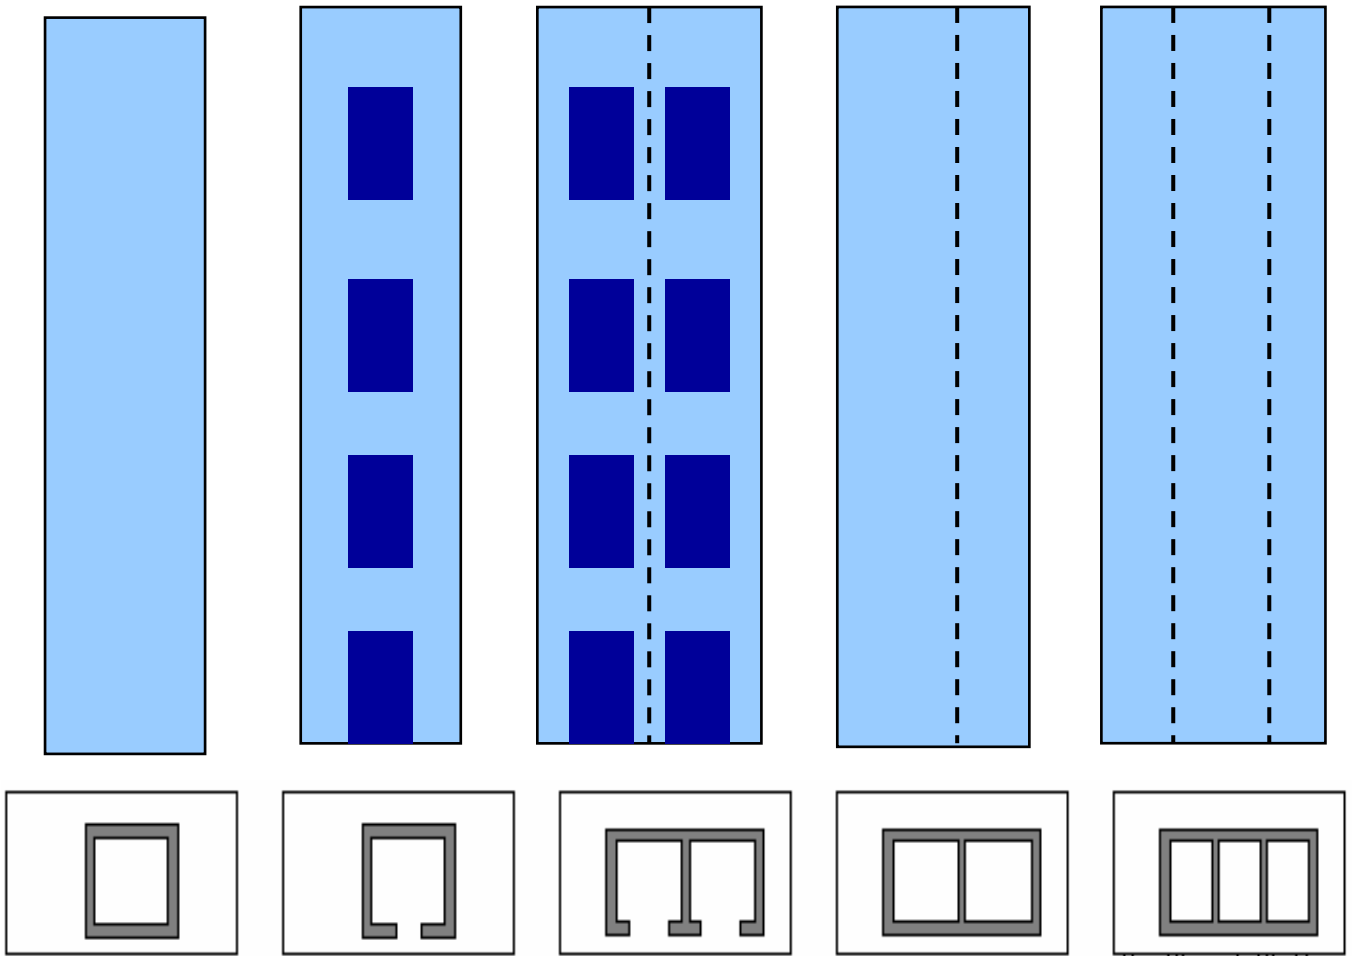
Basic type of Structural Wall (source: Anwar. A., & Yahyah. M. Q., 2009)
